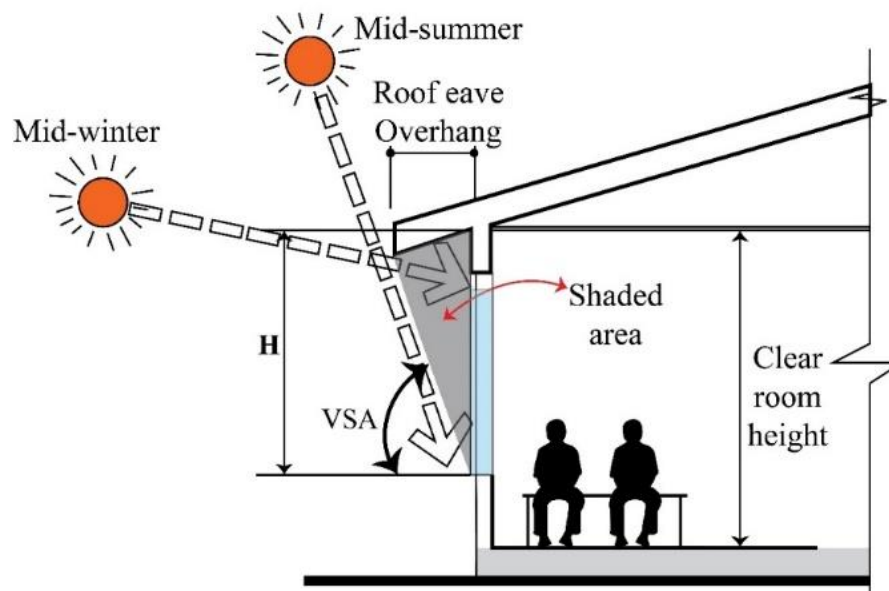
13 Roof eave overhang which used to reduce the direct solar heat gain of the roof through windows (Source: (Mostafa, Zisis et al. 2022))
